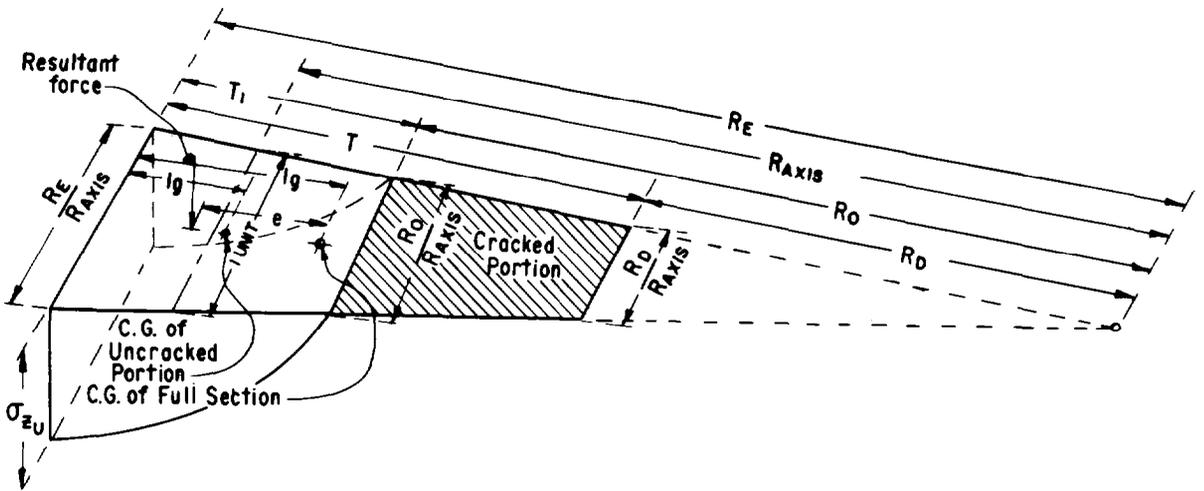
Horizontal section of a cantilever cracked from the downstream face (assuming parabolic stress distribution).—288-D-2978
